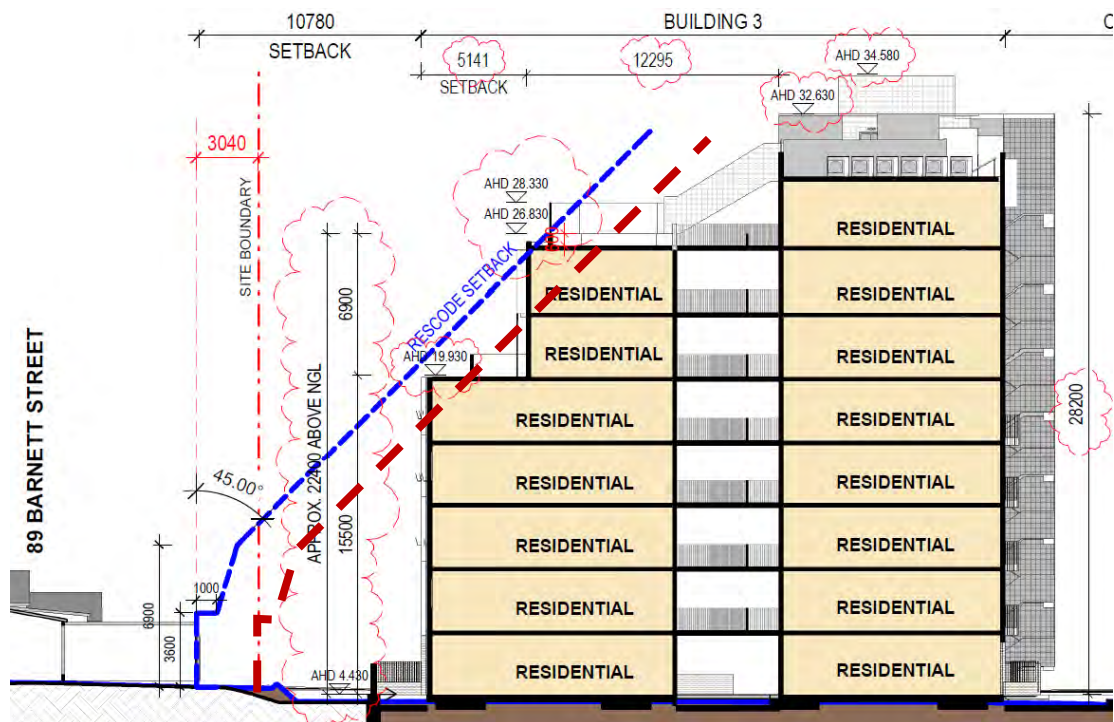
Marked up Section 4 depicting setback of Building 3 from the Council Laneway
